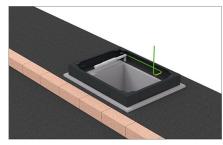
Fastening the plinth; tightening torque of the nuts on the concrete anchor: 30 Nm
